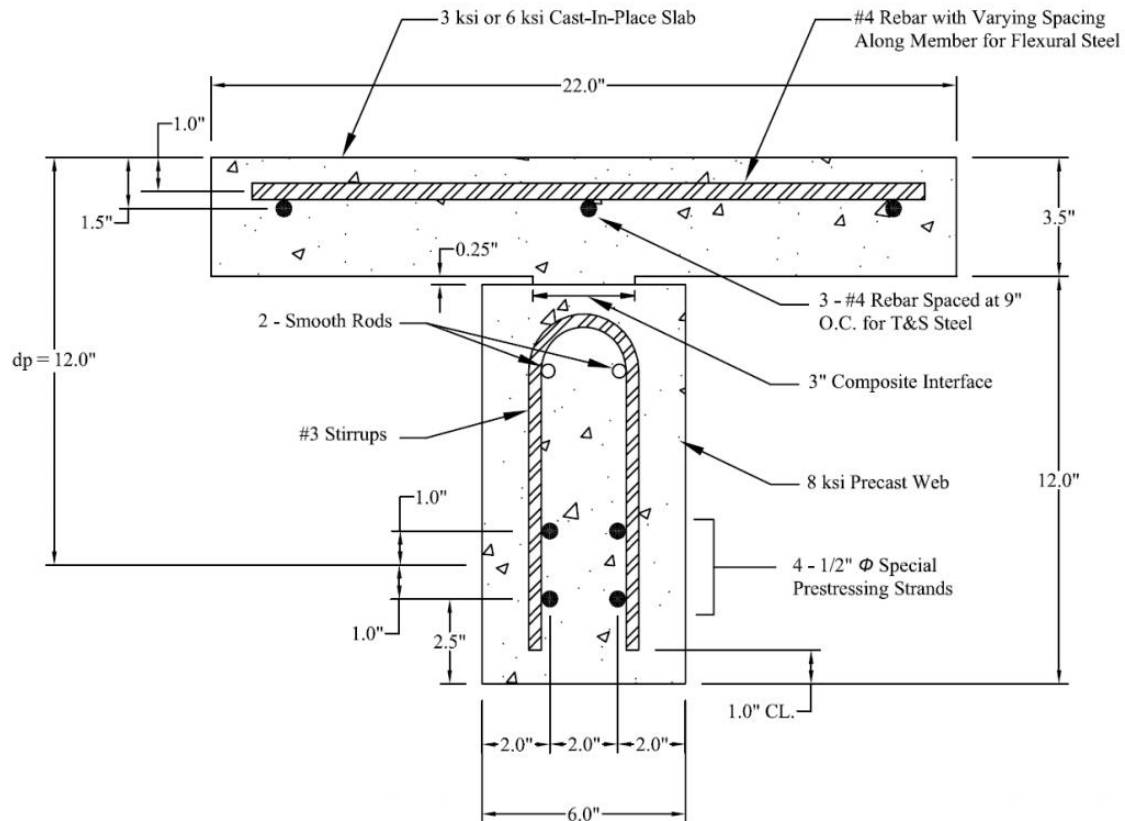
Cross-section of T-beam in Phase 2 tested by Kovach and Naito (2008).
